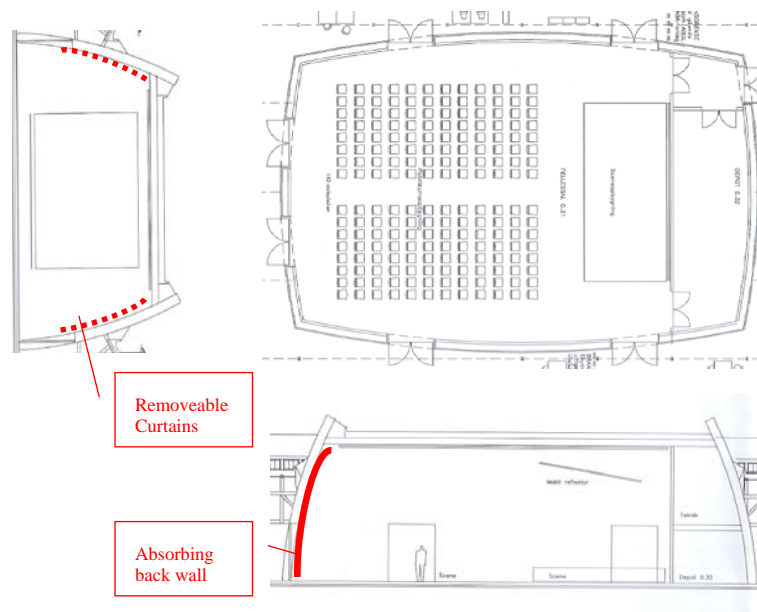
Project-drawings of Music School. Plane view and sections. Room dimensions:
